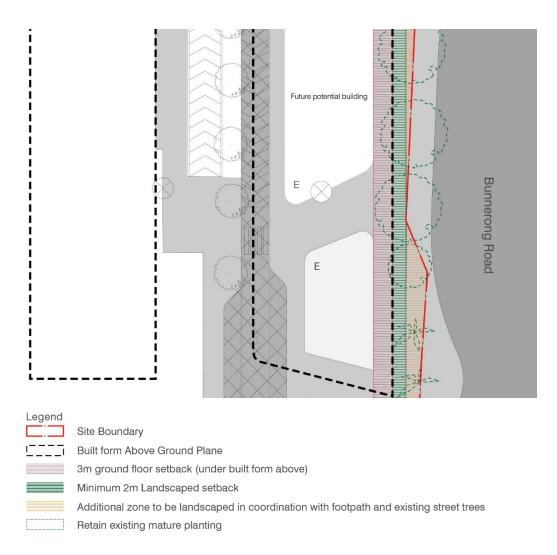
Illustrative master plan showing pedestrian access and a landscape buffer along Bunnerong Road (future plan)
